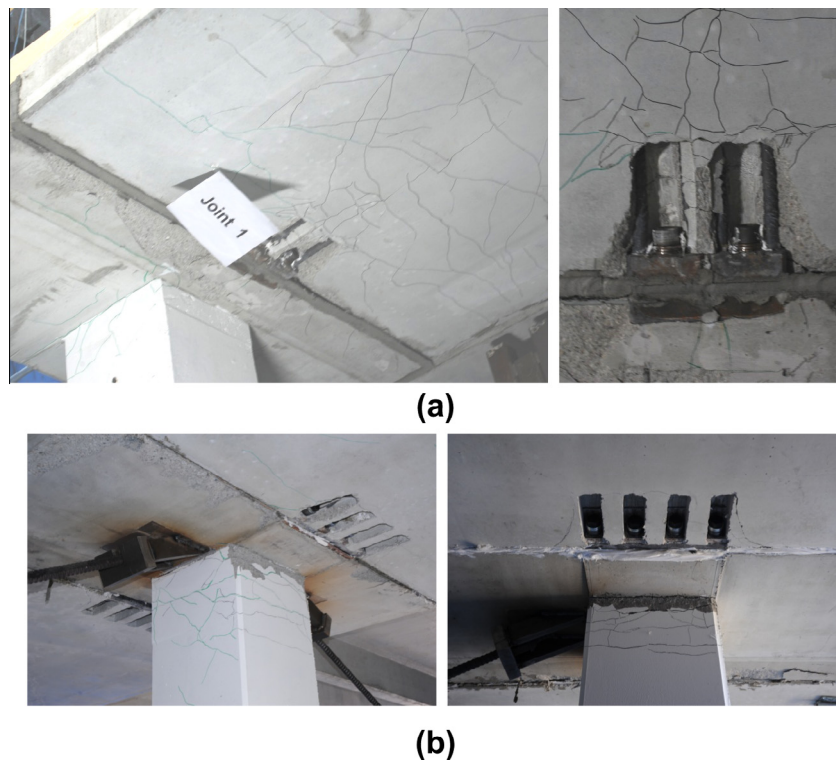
Final damage state: (a) Cracking in the vicinity of an external first floor's (emulative) beam-column joint. (b) Plastic hinging at the top of the first floors' columns in a central beam-column joint.
